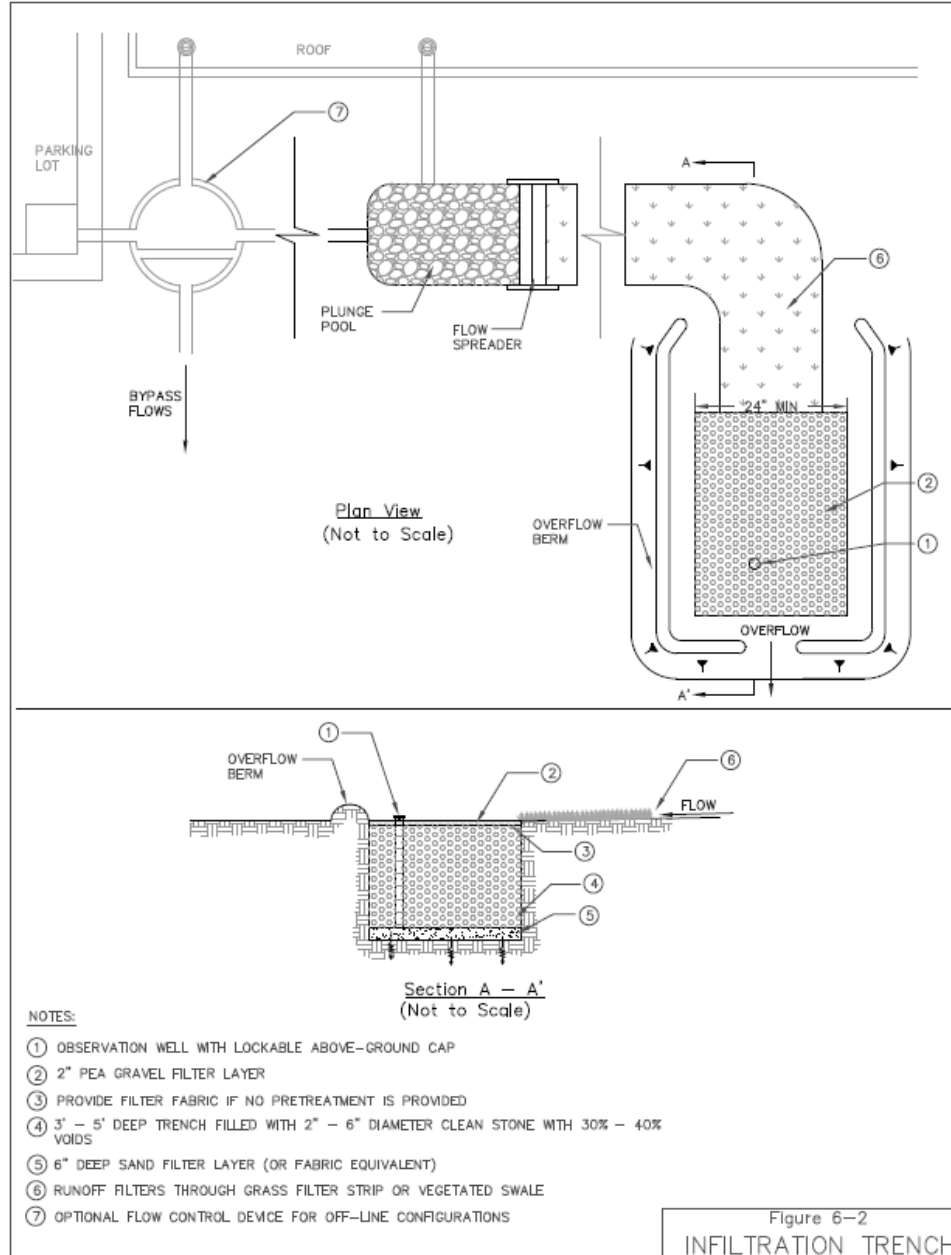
Infiltration trench plan and section view from the LACDPW BMP Design and Maintenance Manual (2009).
